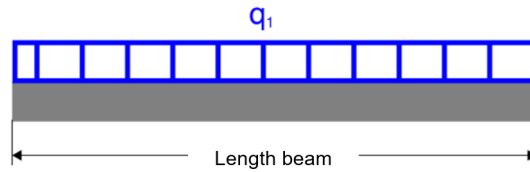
Governing load on the front foundation beam of 5.1 meters
